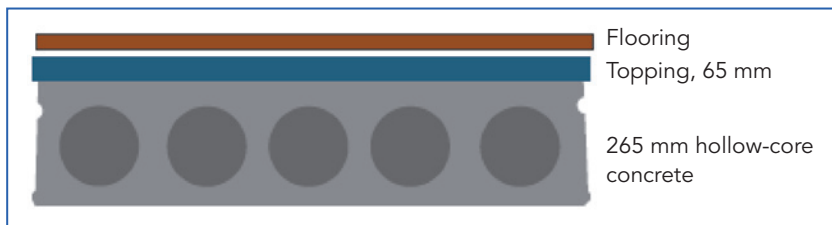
Example of prefabricated hollow core concrete slab floor.
